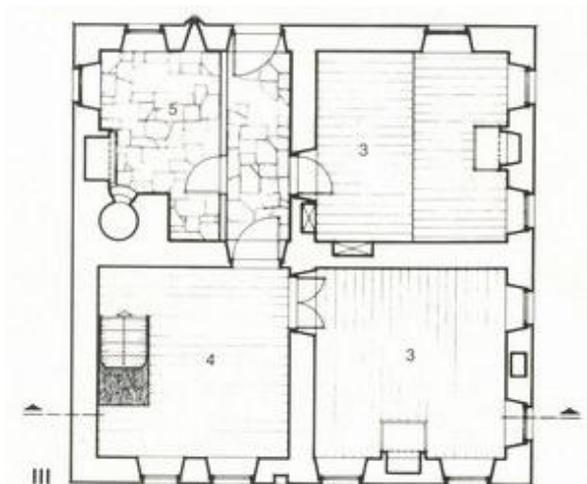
Typical floor plan of a mountain house in Little Papigko (260)
